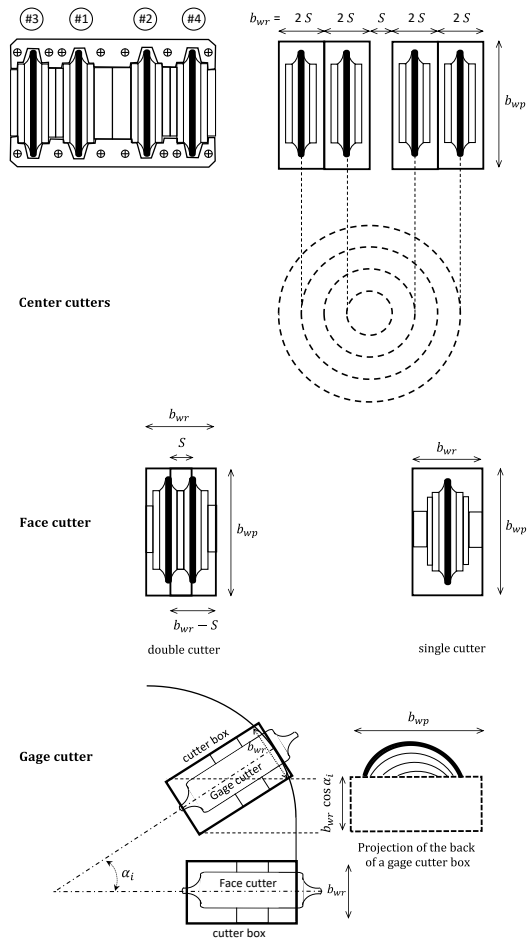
Dimensions of various cutter boxes on the surface of the cutterhead
